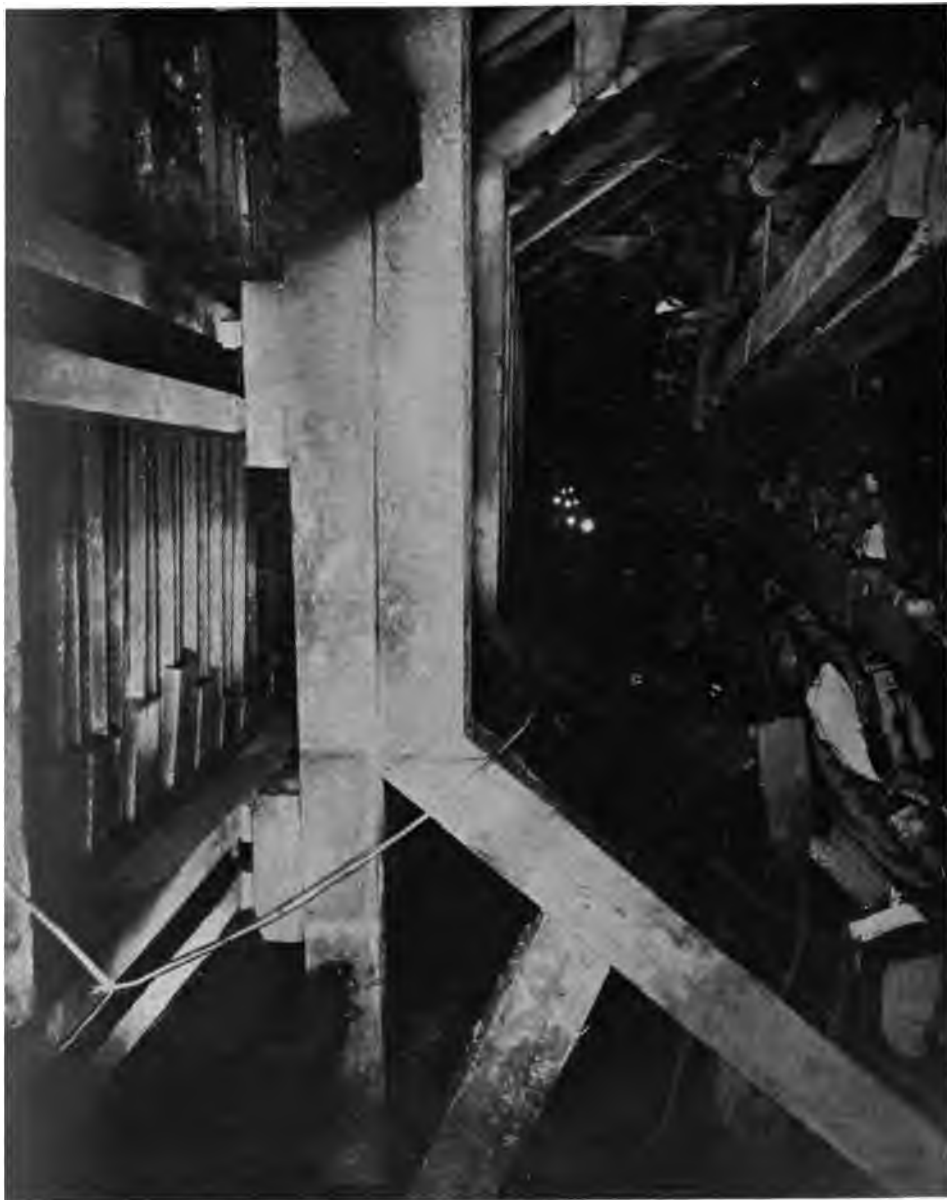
Contract 66. Tunneling in Heavy Broken Rock, Using Steel Crown-bars and Channel Lagging Over Temporary Timber Bents, as per Method Shown on Pl. 221.
